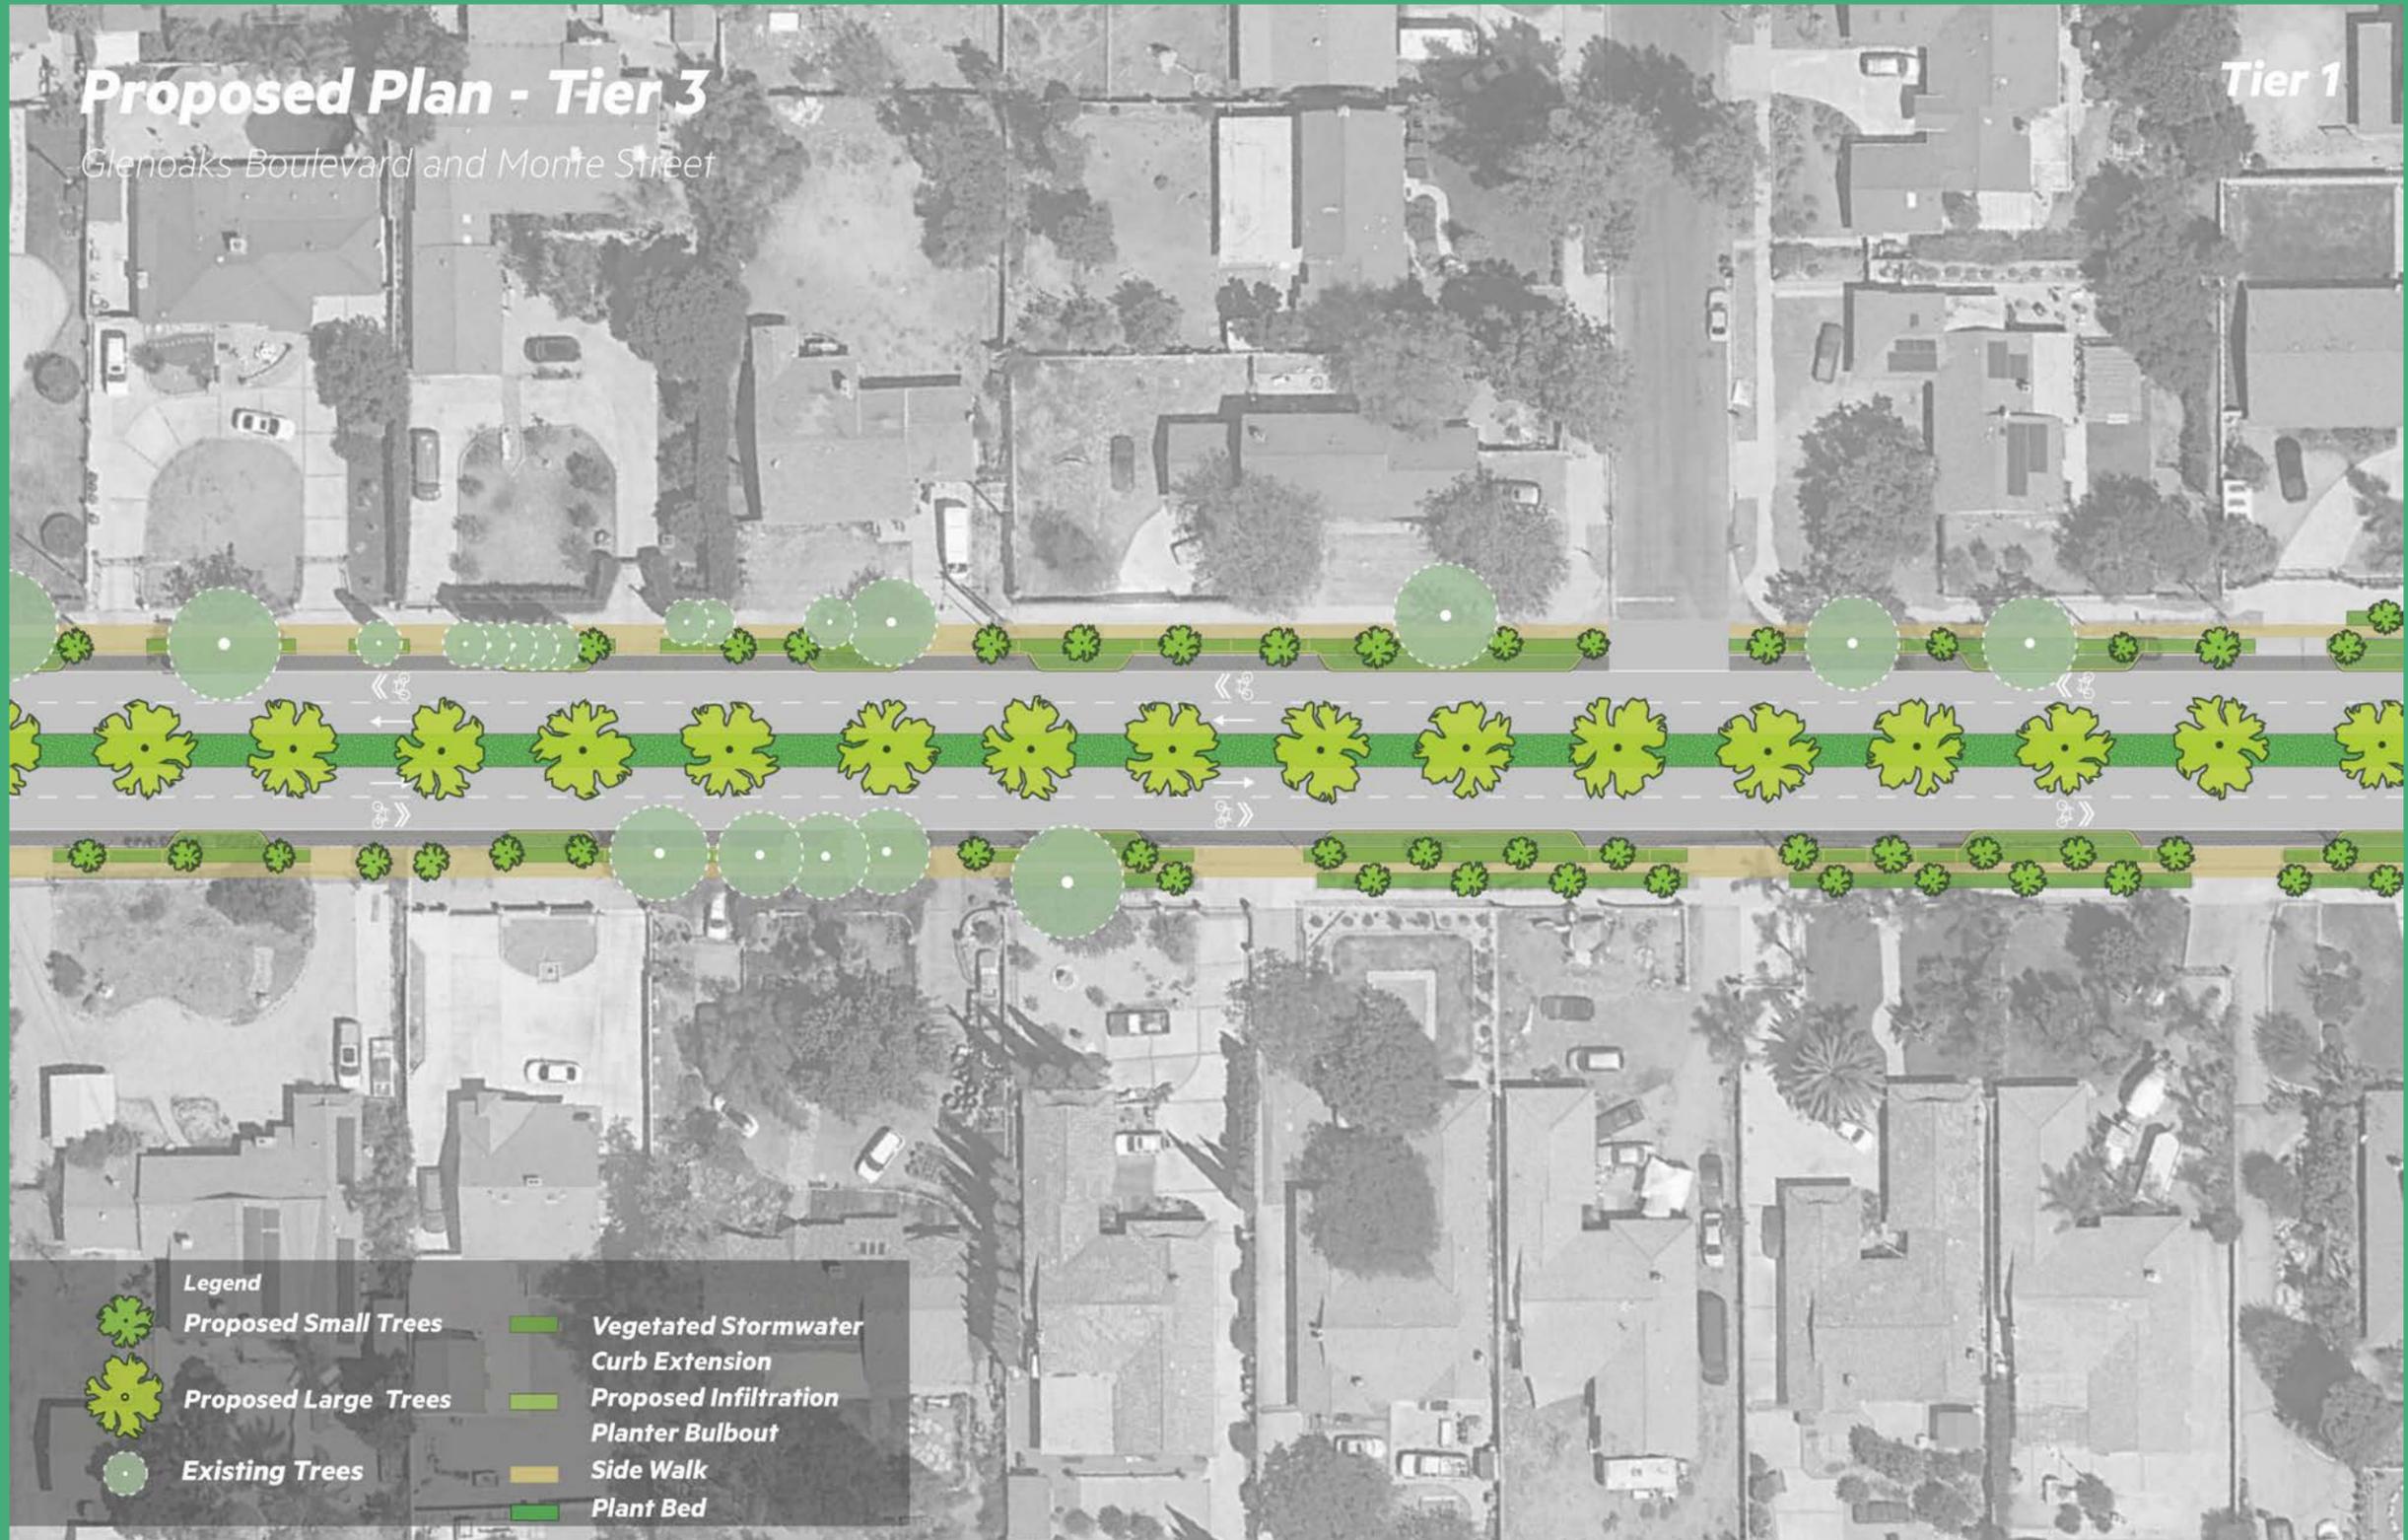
Glenoaks Boulevard and Monte Street, proposed Tier 3 plan
